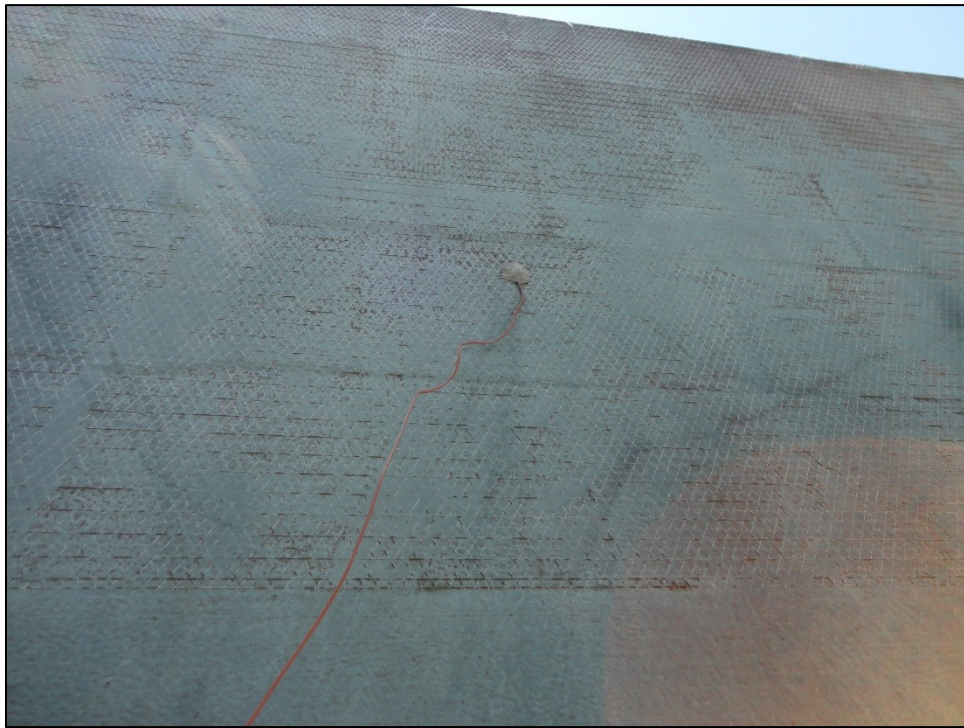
Wall 2 Location 2 Photo (North Side)
